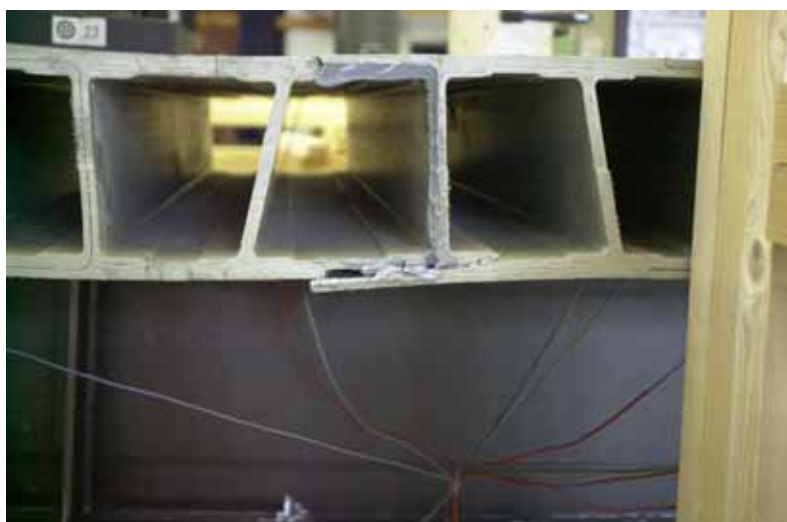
Initial failure in axis K - K in the epoxy adhesive joint of the lower deck face sheet between the jacks.
